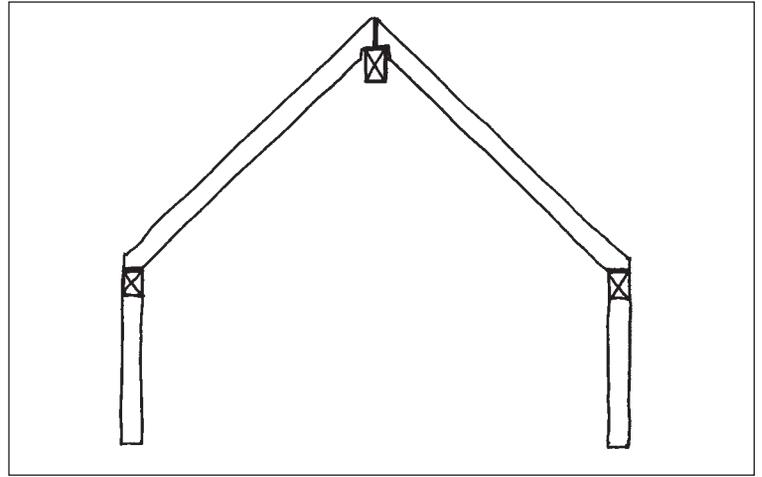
Ridge-supported rafters act like individual shed rafters.
